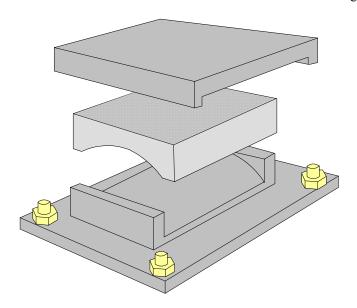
Self-lubricating Bronze Sliding Plate Bearing
